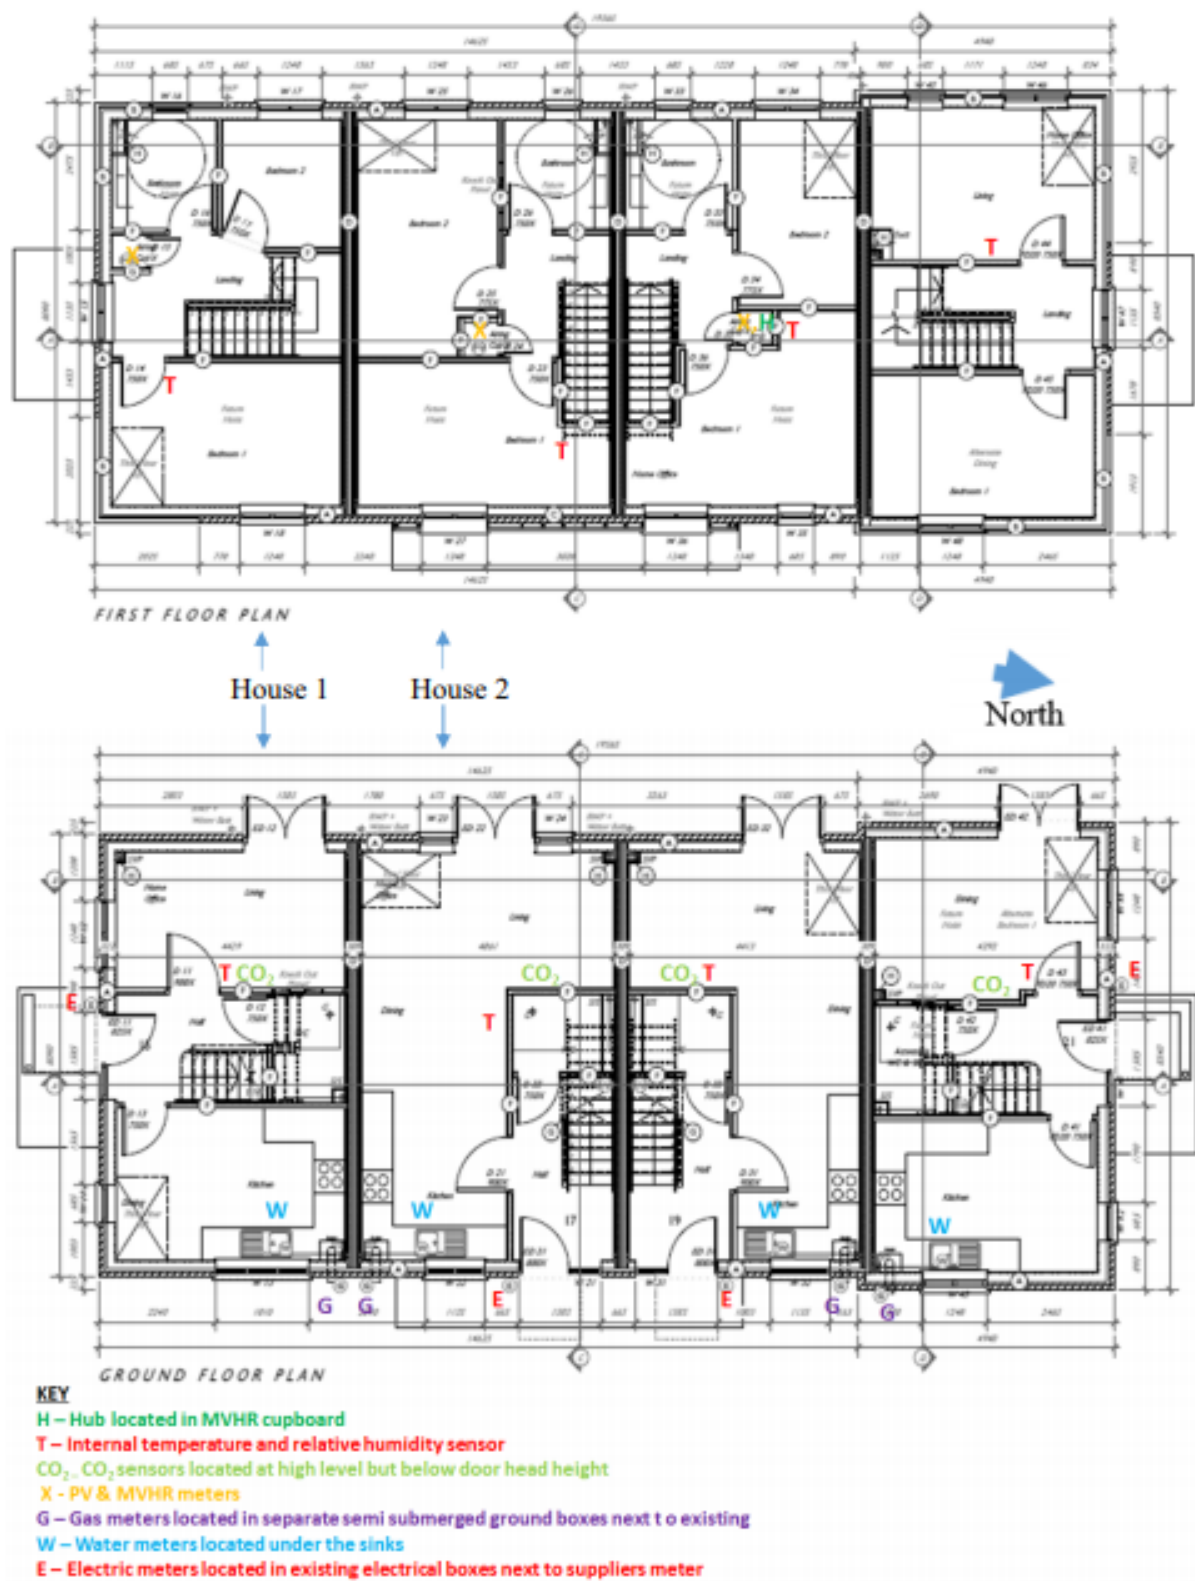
Floor plans of the Gainsborough case study houses (Sodagar & Starkey, 2016).
